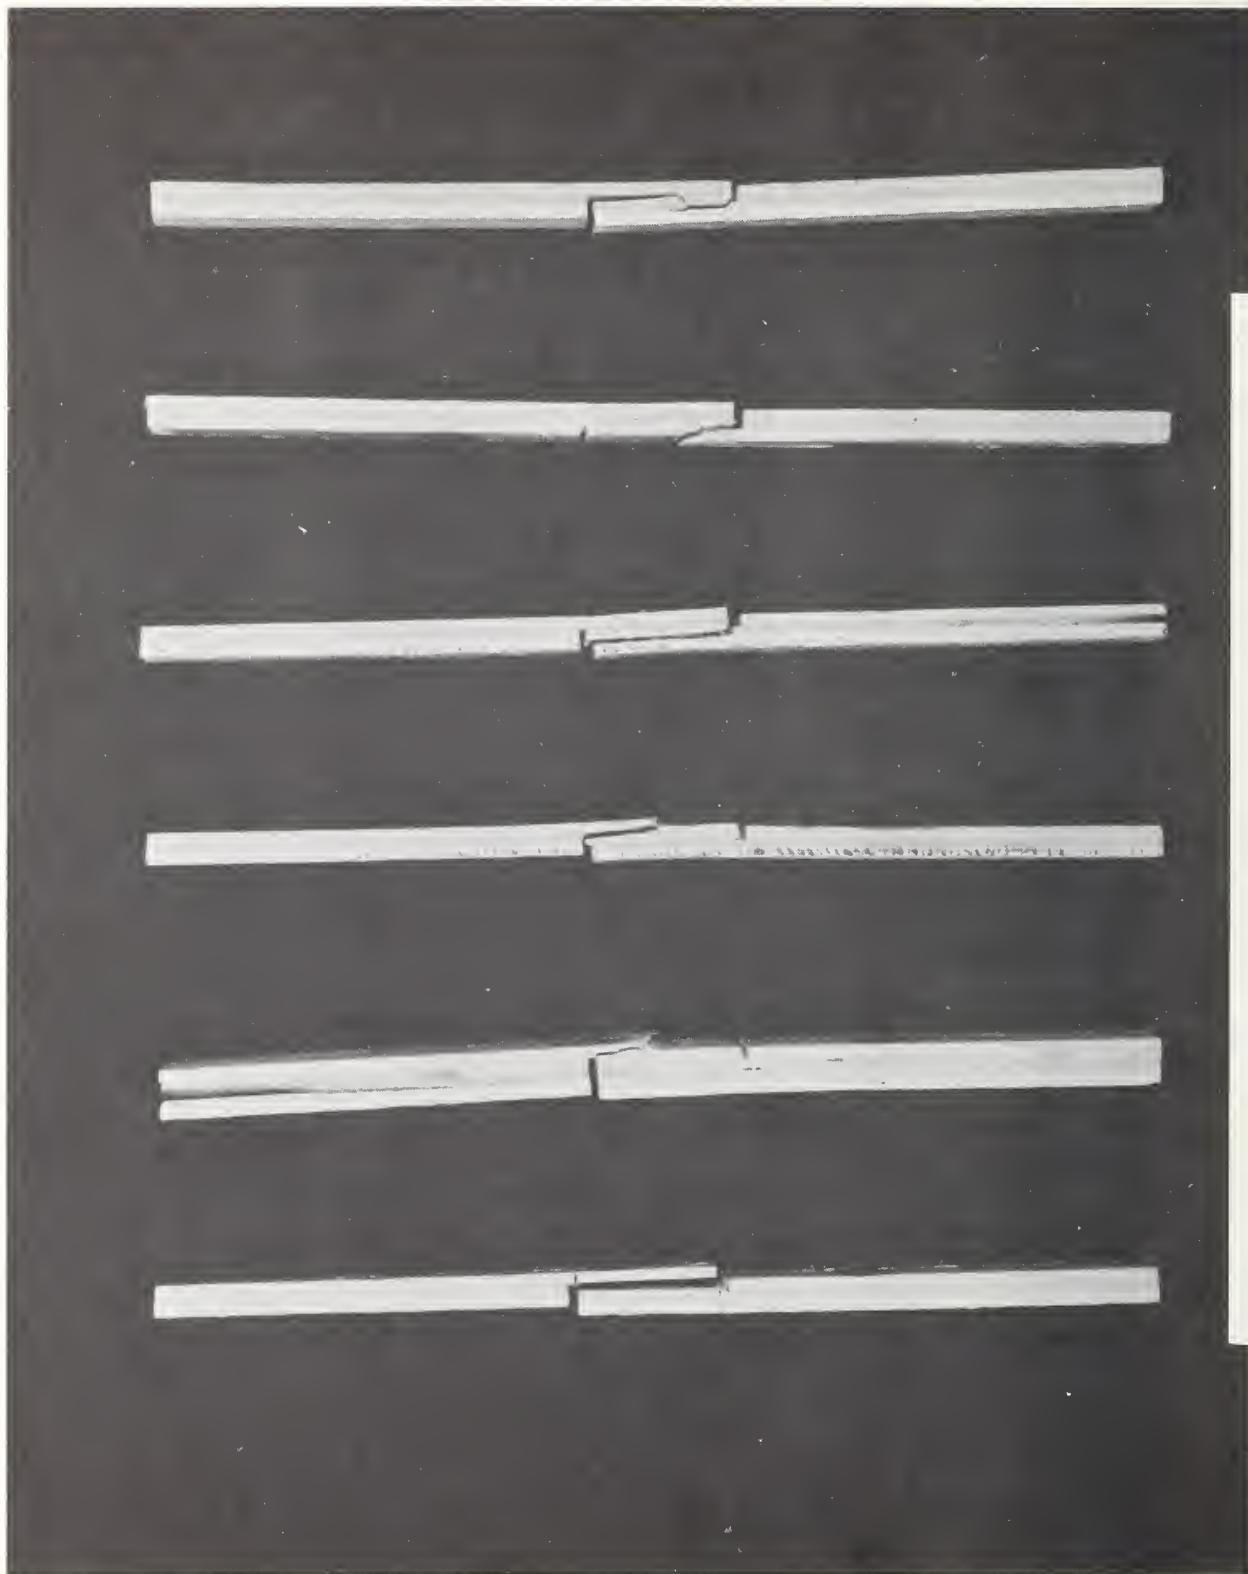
Typical failures in specimens with notch type 2.
